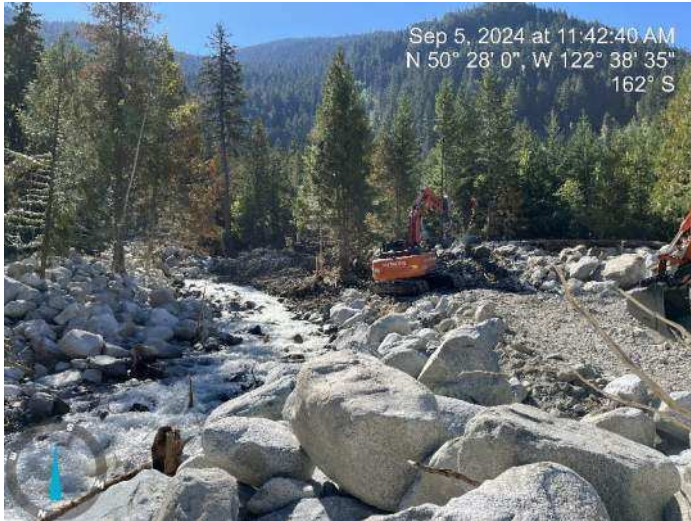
210 excavator continued sorting through excavated materials to build up the proposed embankment. 350 excavator continued to widen the right bank of the existing channel (2024-09-05 @ 11:42 AM)
